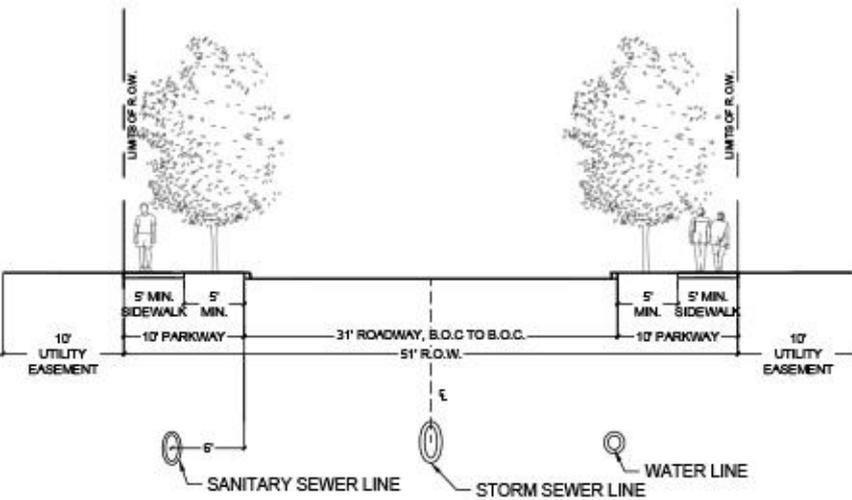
EXHIBIT I - PERMITTED NON-STANDRD STREET SECTIONS
